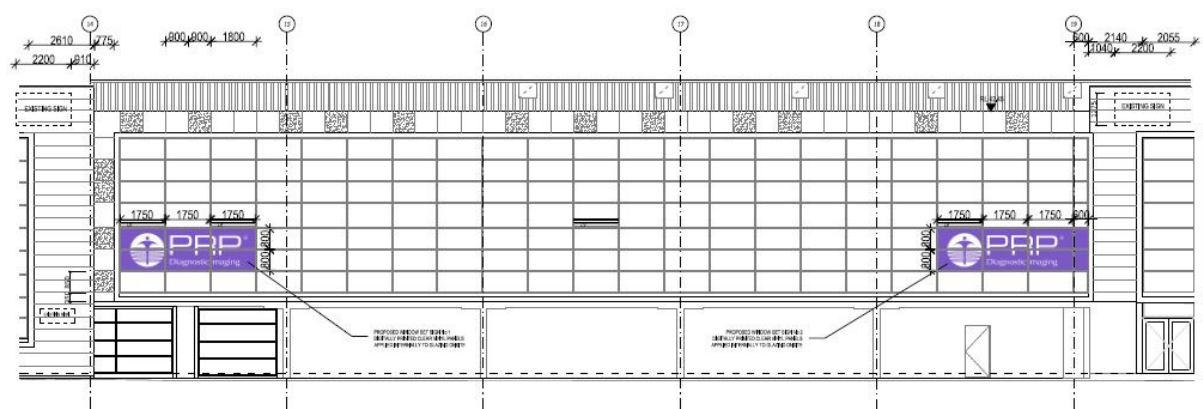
North Elevation Drawing showing where the Proposed Window Signs will be located.
